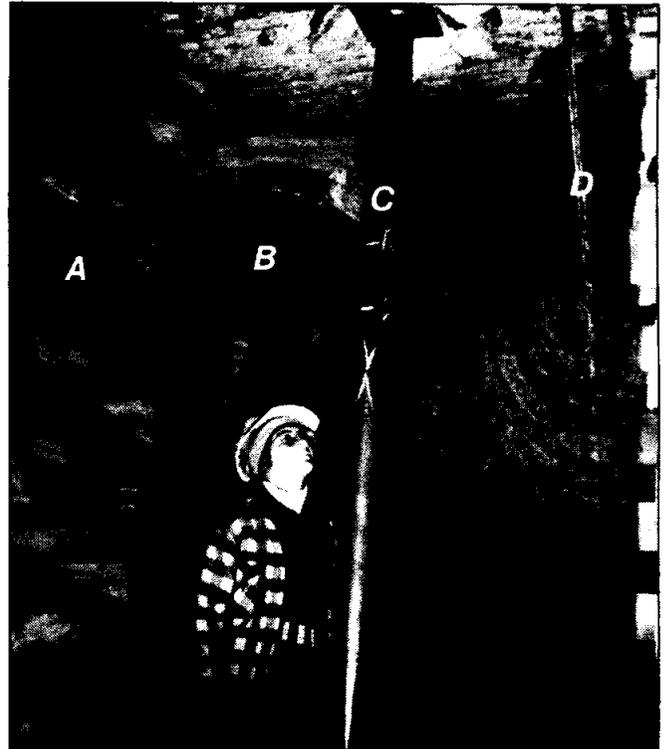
Example of heavy roof support in gate road experiencing cutter roof crack formation. A, Wooden crib; B, concrete crib; C, yieldable post; D, failed roof truss.
